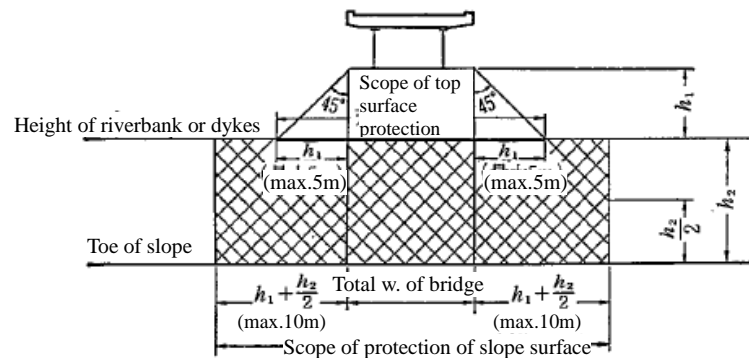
Scope of protection of riverbank below a bridge or banks
